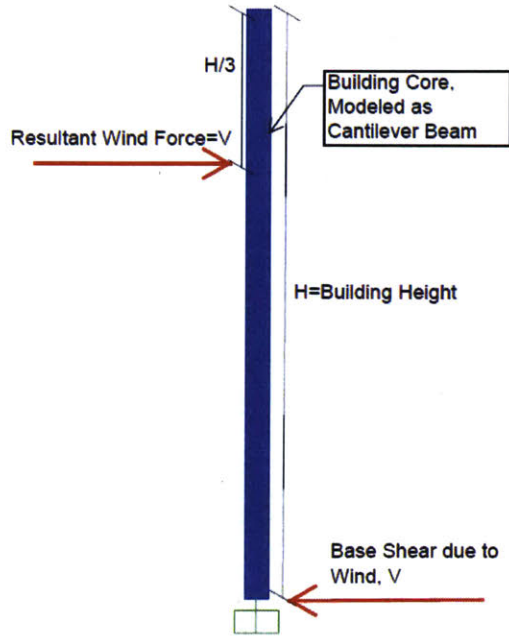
CONCRETE CORE MODELED AS CANTILEVER BEAM
